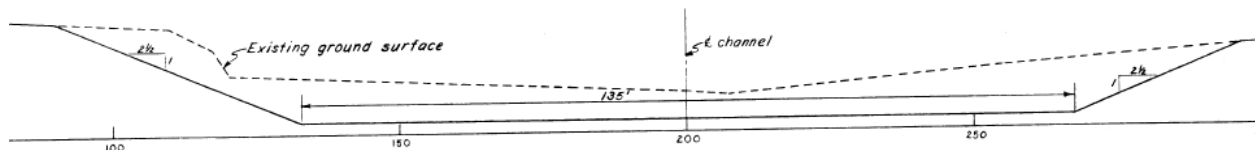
Channel Cross Section Station 500 Feet Downstream of Concrete Drop Structure
